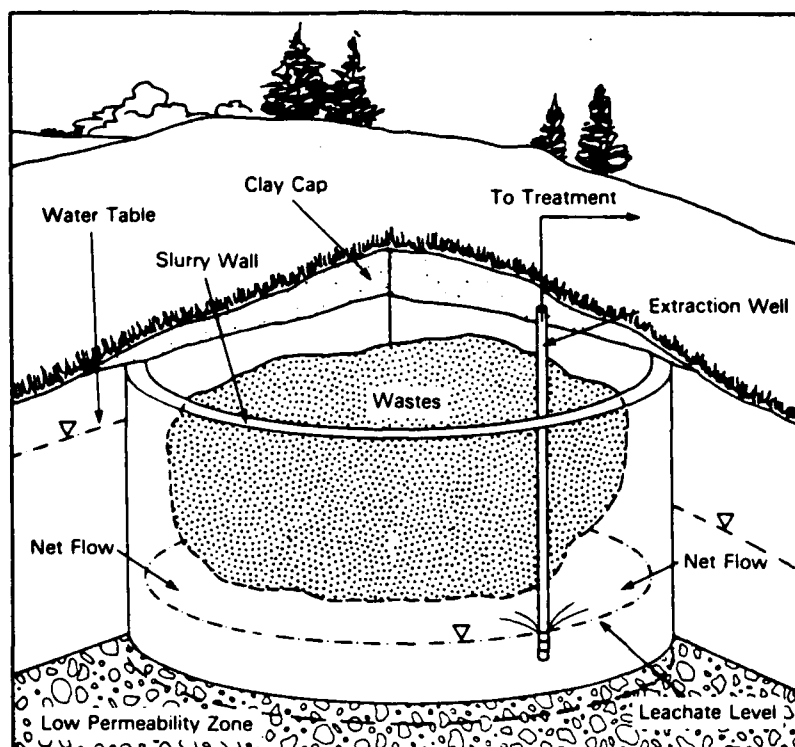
Cross section of circumferential wall placement (from USEPA 1984)
